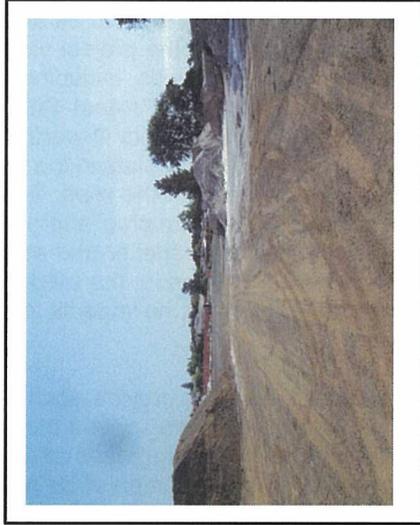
View to northeast across site with B Avenue, existing animal shelter facilities, and residential neighborhood in background.
